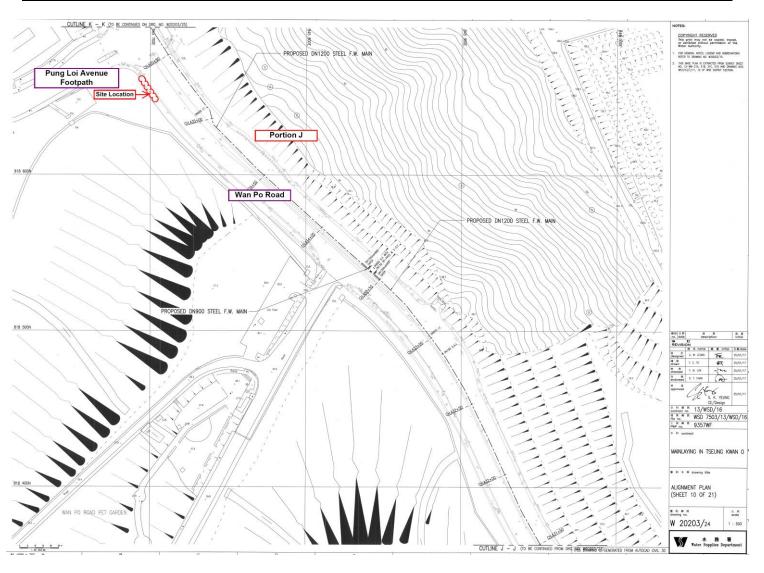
Location Plan for Portion J-Pung Loi Avenue Footpath (PLA 1)
